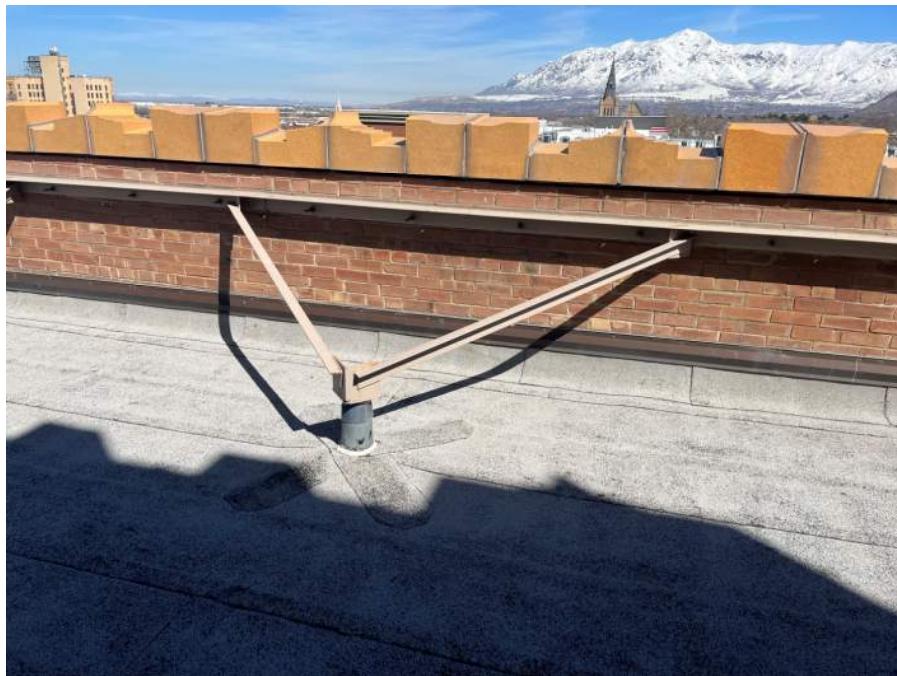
Unreinforced masonry parapets braced back to roof diaphragm
